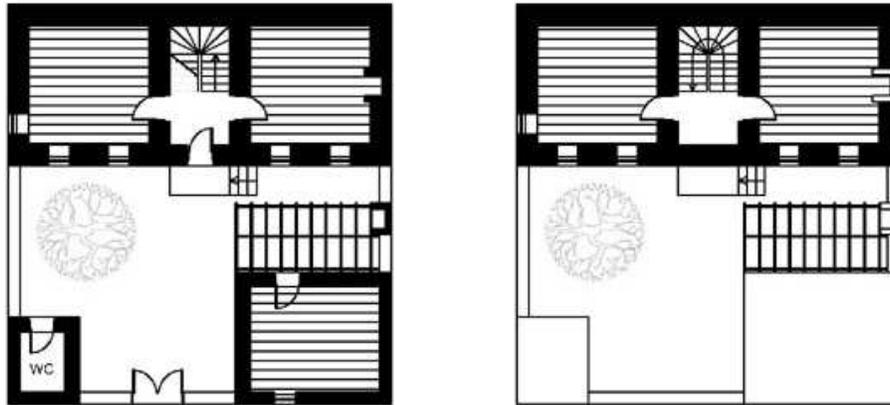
House type 1: ground floor plan (left) and first floor plan (right) (Drawings by author)
